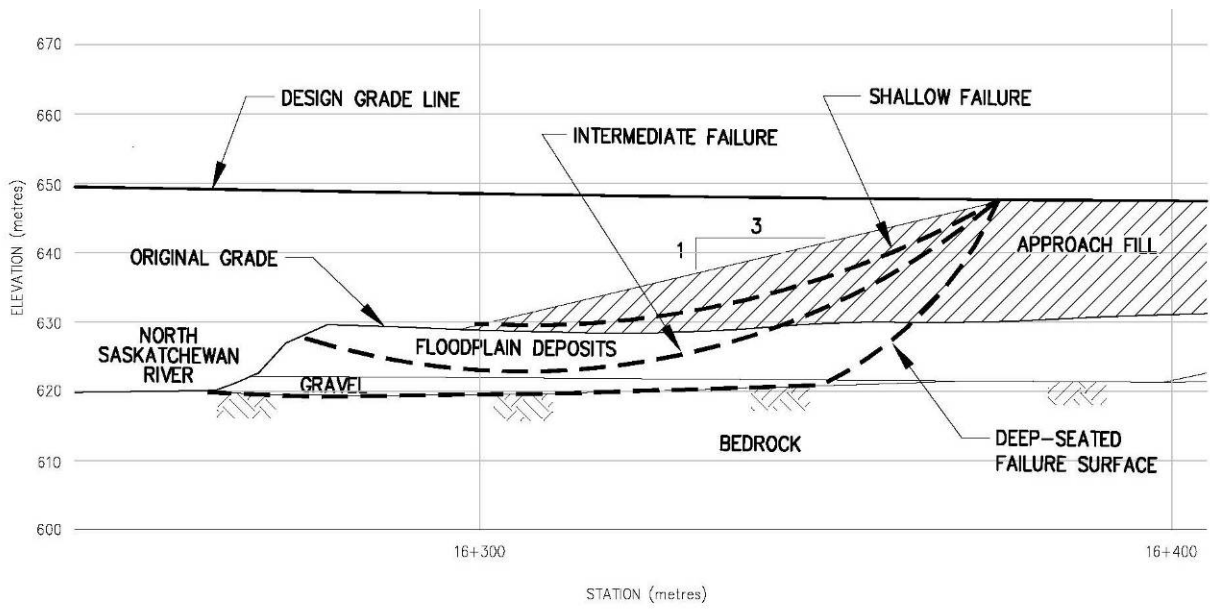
East Approach Fill Stratigraphy and Typical Failure Surfaces
